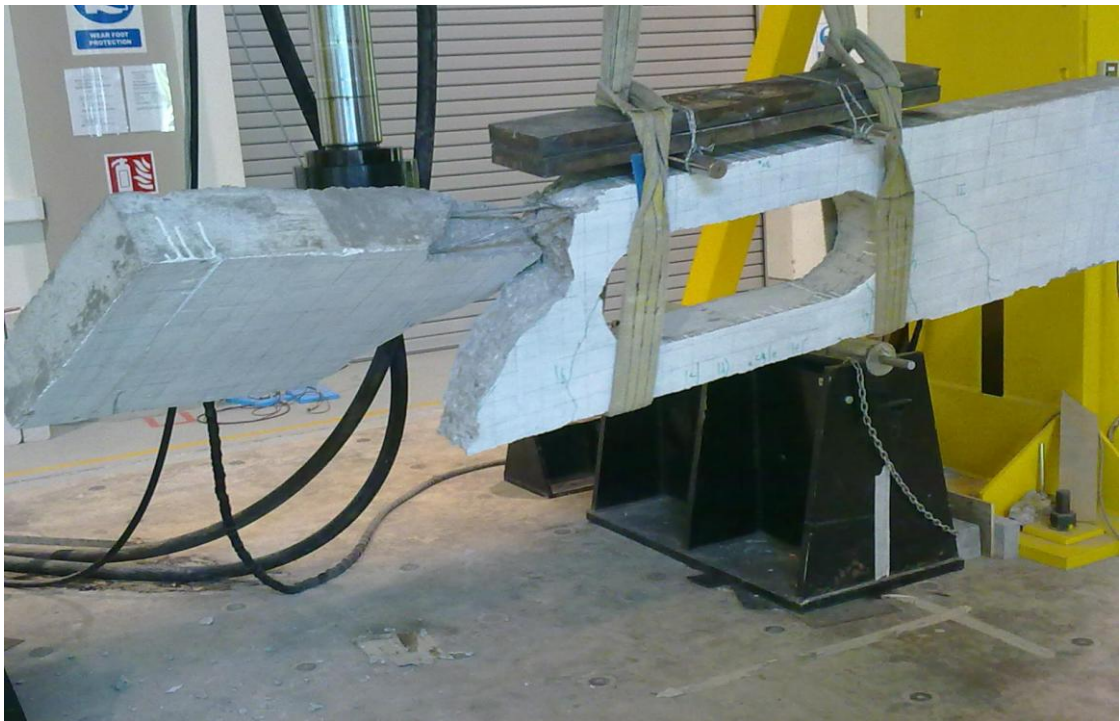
Failure Mode of Beam with Elliptical Opening with Additional Reinforcement Bars along the Edges subjected to Cyclic Load
